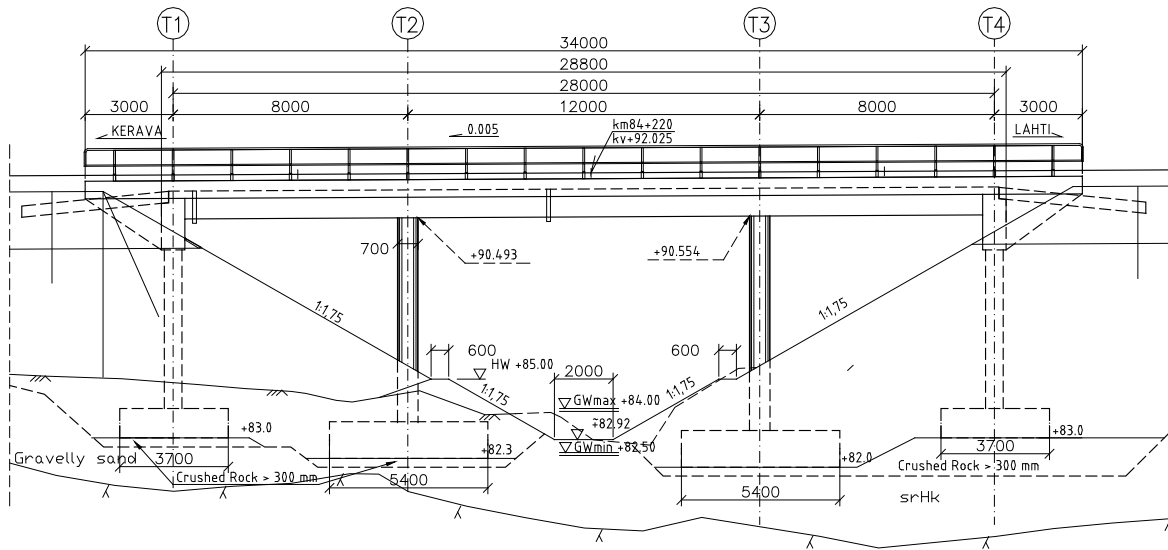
Elevation of Tekemäjärvenoja Bridge.
